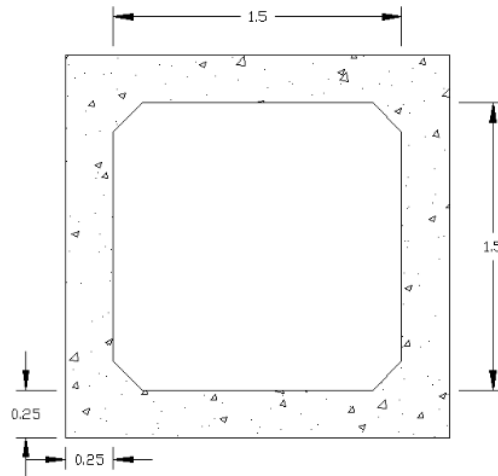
Design Plan Sketch of Box Culvert 1.5 m × 1.5 m
